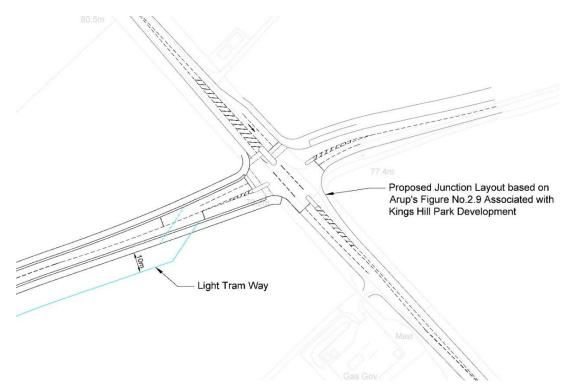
Potential Access arrangement from Stoneleigh Road
